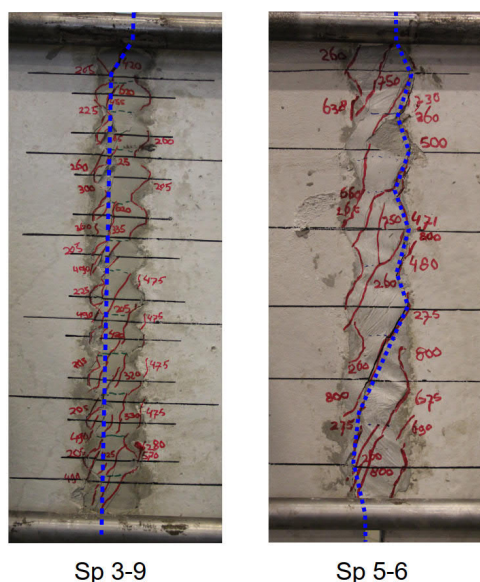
Aligned small shear key connection (Specimen 3-9) and Serrated waterjetten shear connection (Specimen 5-6) with failure cracks
